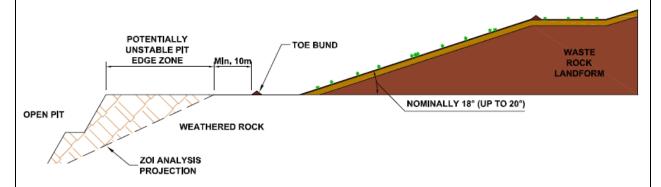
Cross-Section Showing Landform Stand-Off from Zol Boundary
